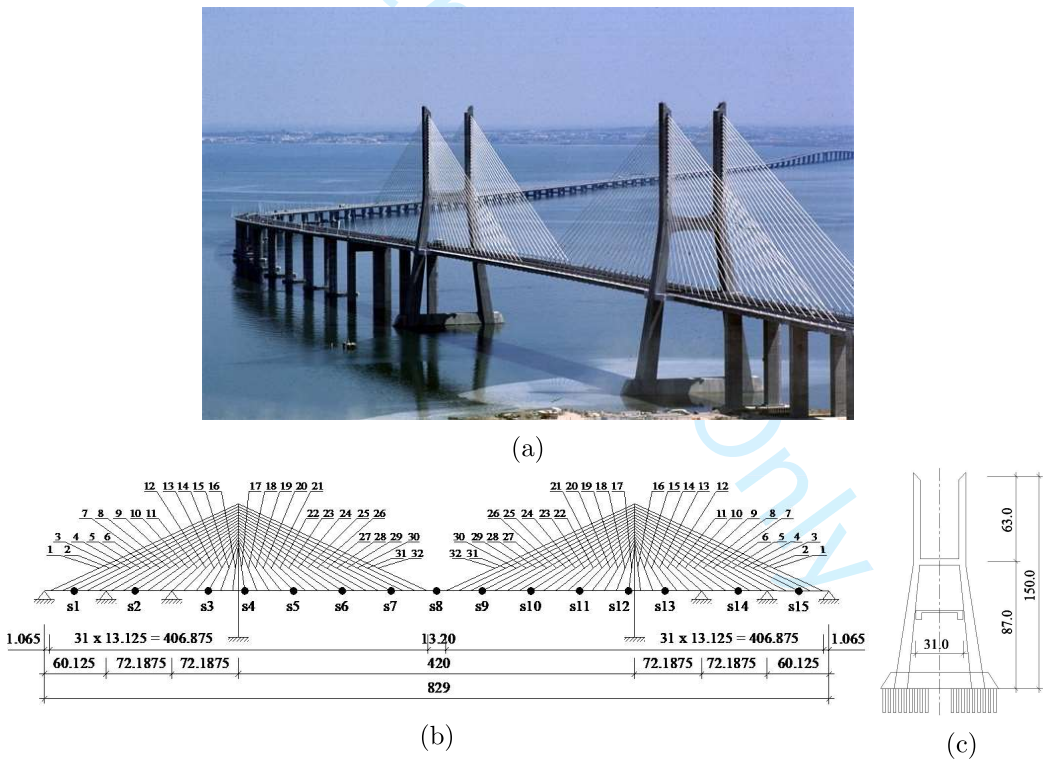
a) Vasco da Gama bridge located in Lisbon, Portugal (*Vasco de Gama bridge*, 2011) b) Schematic representation of the bridge and measurement points’ location c) Pylon elevation with dimension in place.
